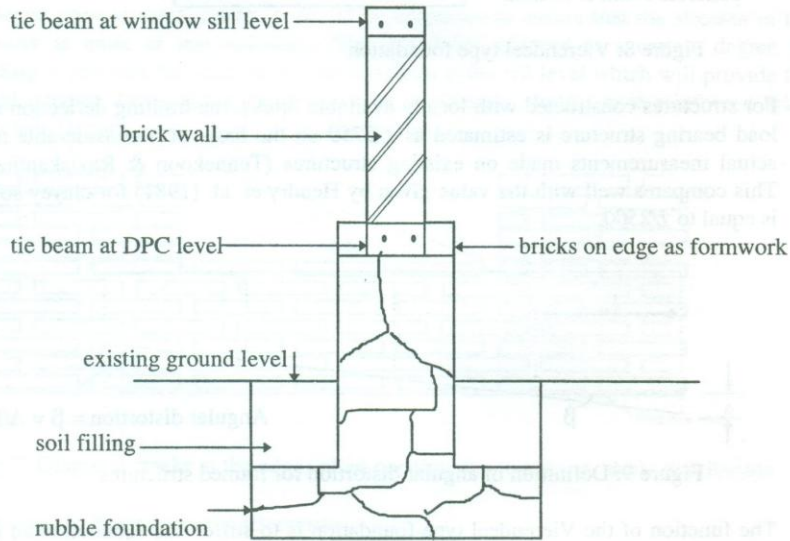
Rubble foundation with tie beams at DPC and window sill levels
